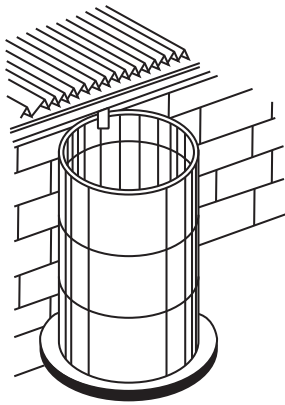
Concrete ring tank (courtesy of Erik Nissen-Petersen)
